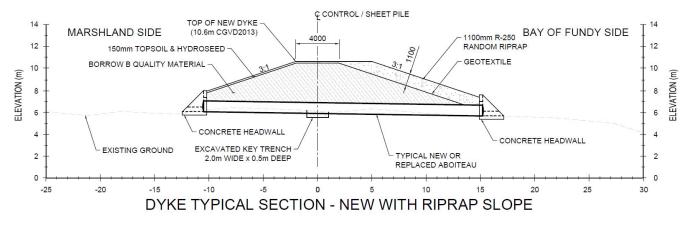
Dyke Typical Section for New with Riprap, Option B
